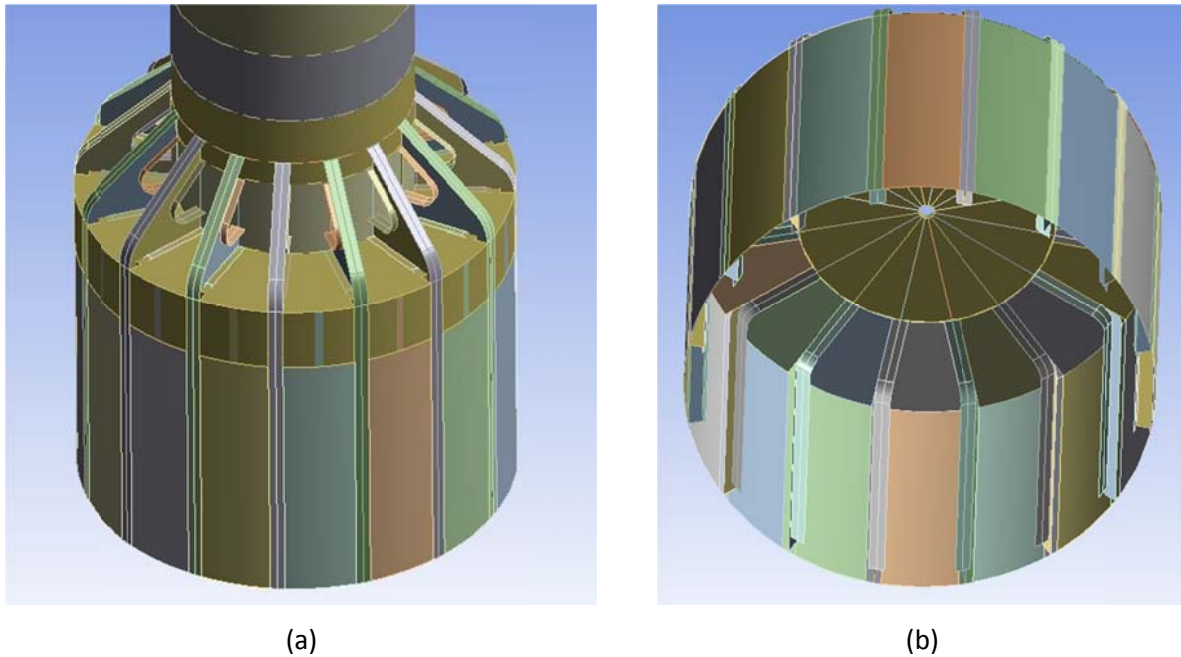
(a) Web frame configuration connecting shaft and bucket. (b) bucket Inner beam.
